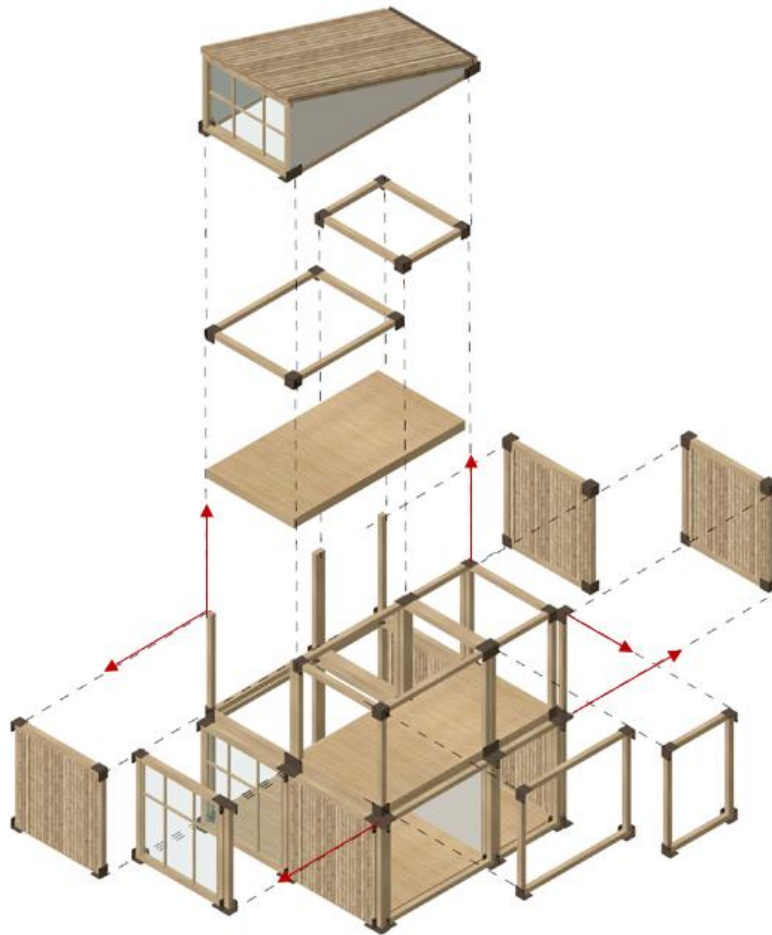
Disassembly and Reuse: Modular Timber System Exploded View (by the author)
